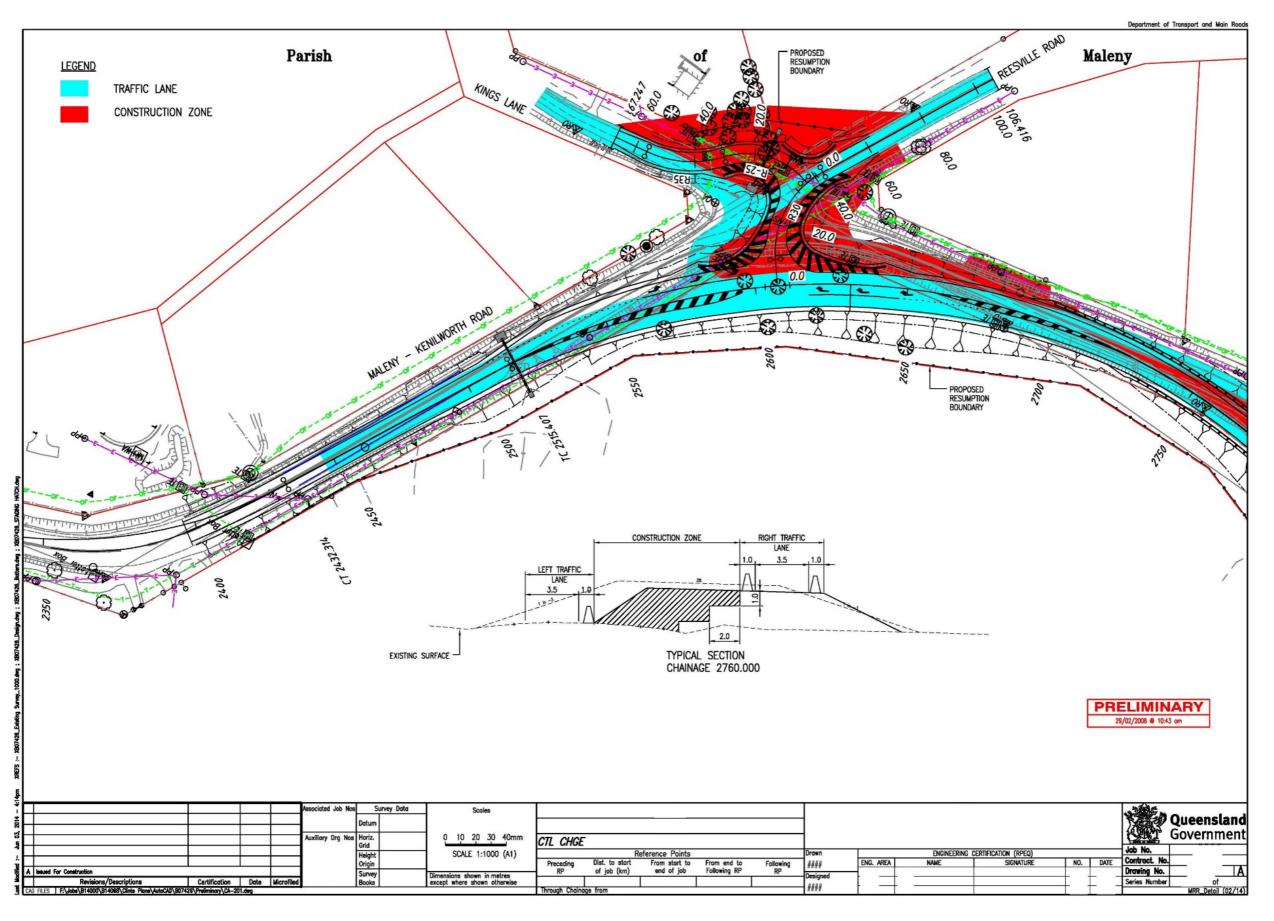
(c) – Construction staging – generic example 2 – sheet 1 of 2
